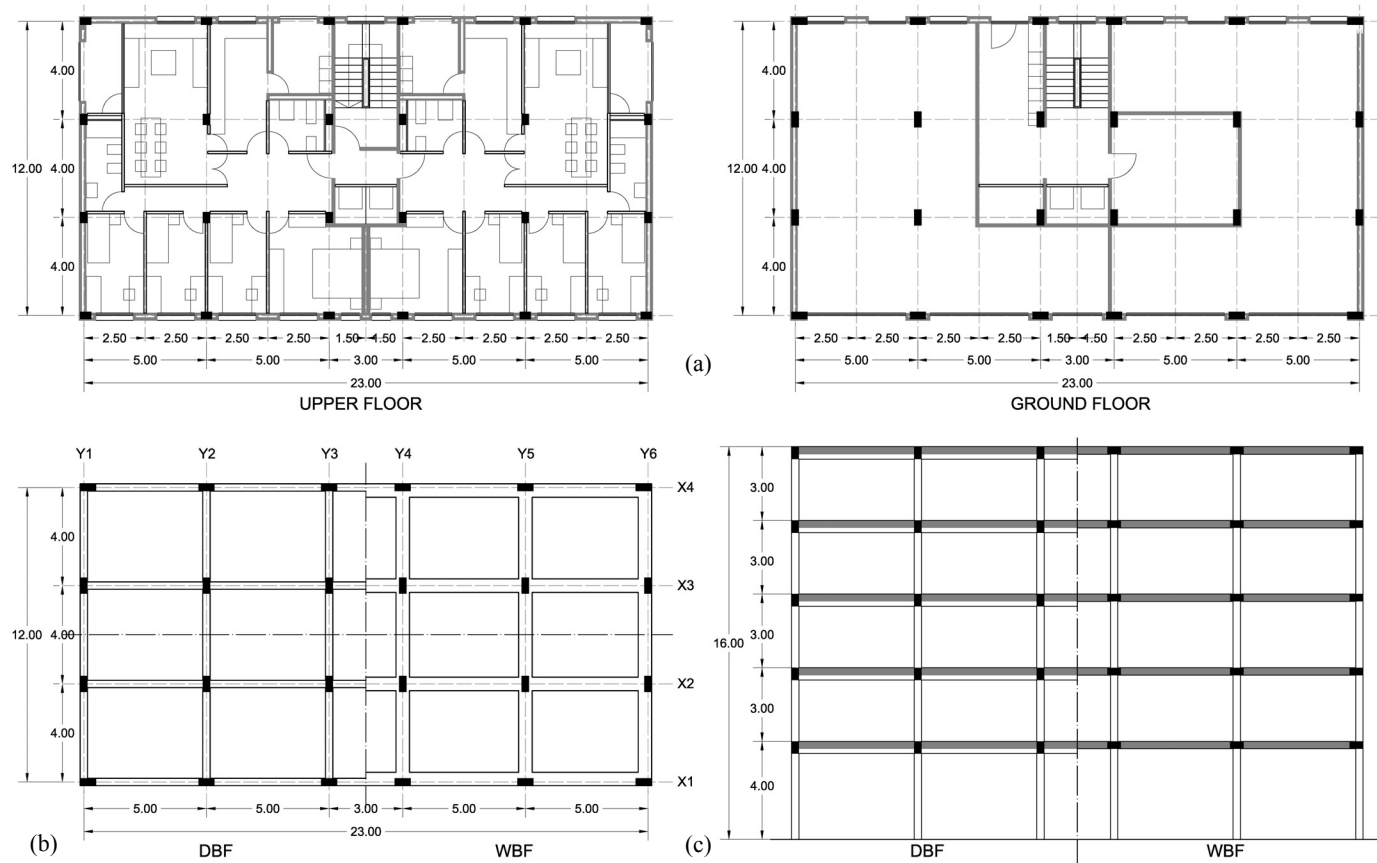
Case study; distribution (a) and structural arrangement in plan (b) and in elevation (c).
